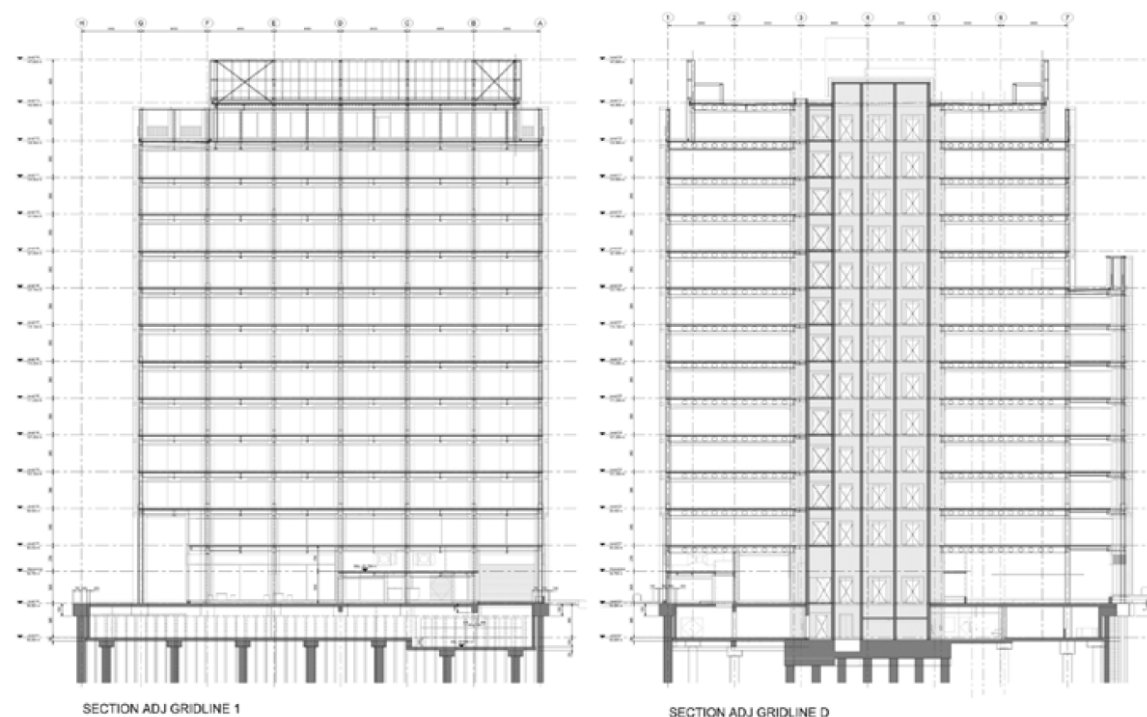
TYPICAL SECTIONS THROUGH BUILDING
